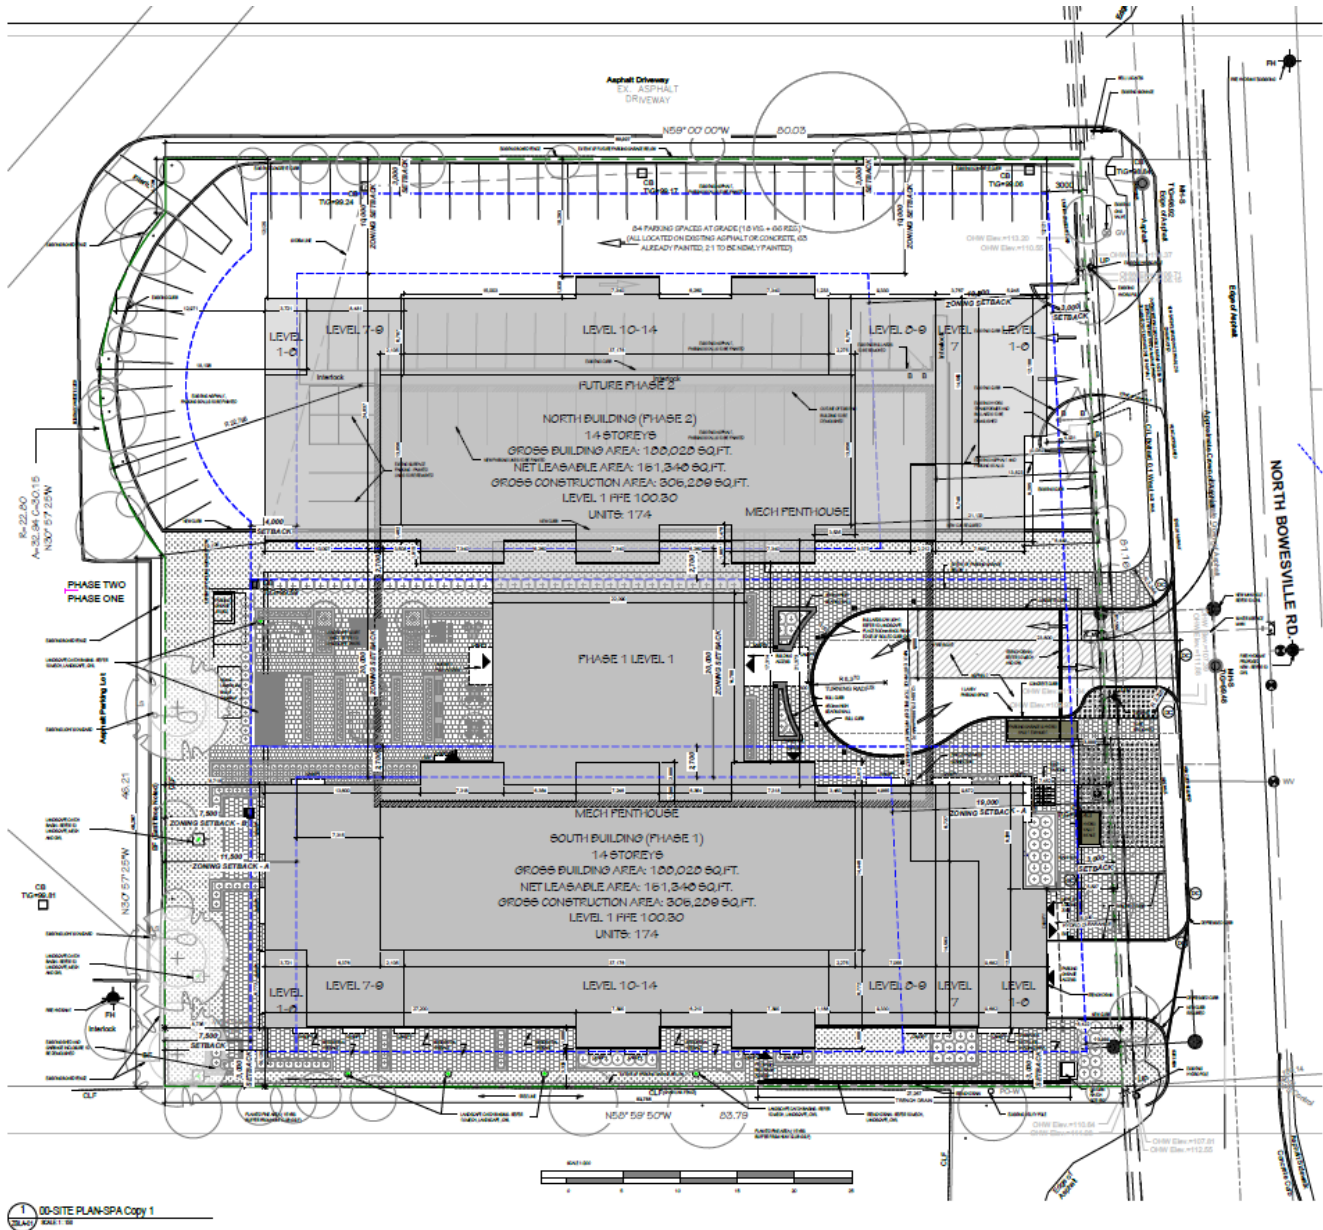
Site Plan for 3750 North Bowesville Road, prepared by Hobin Architecture
